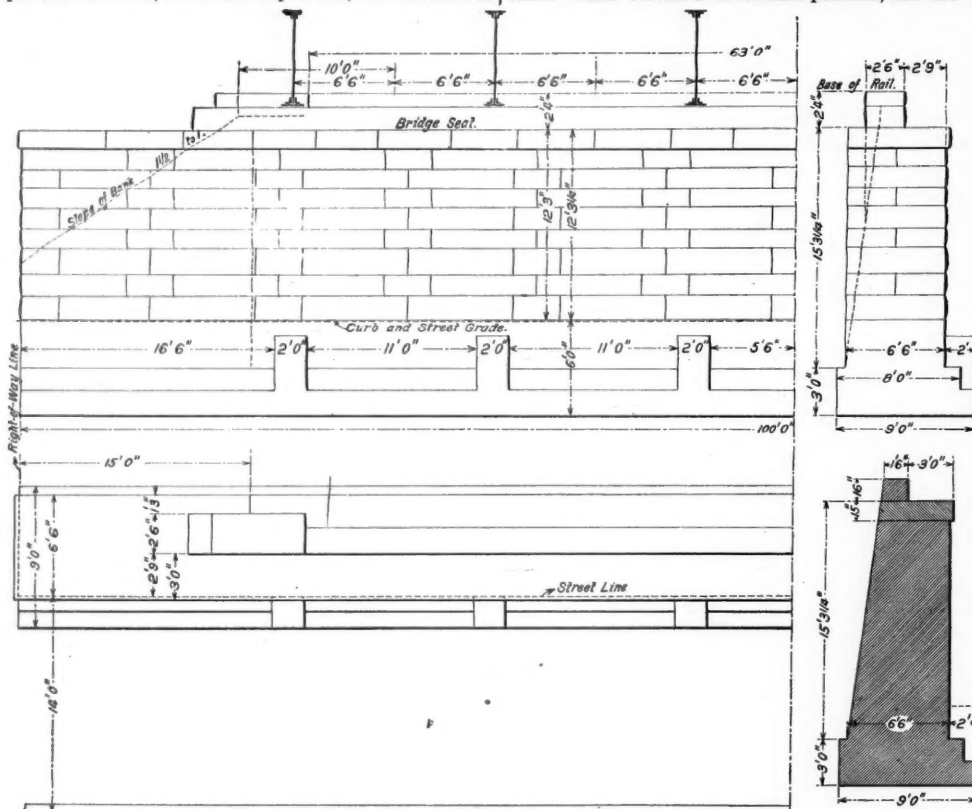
Homan Avenue Subway—Chicago Track Elevation.
